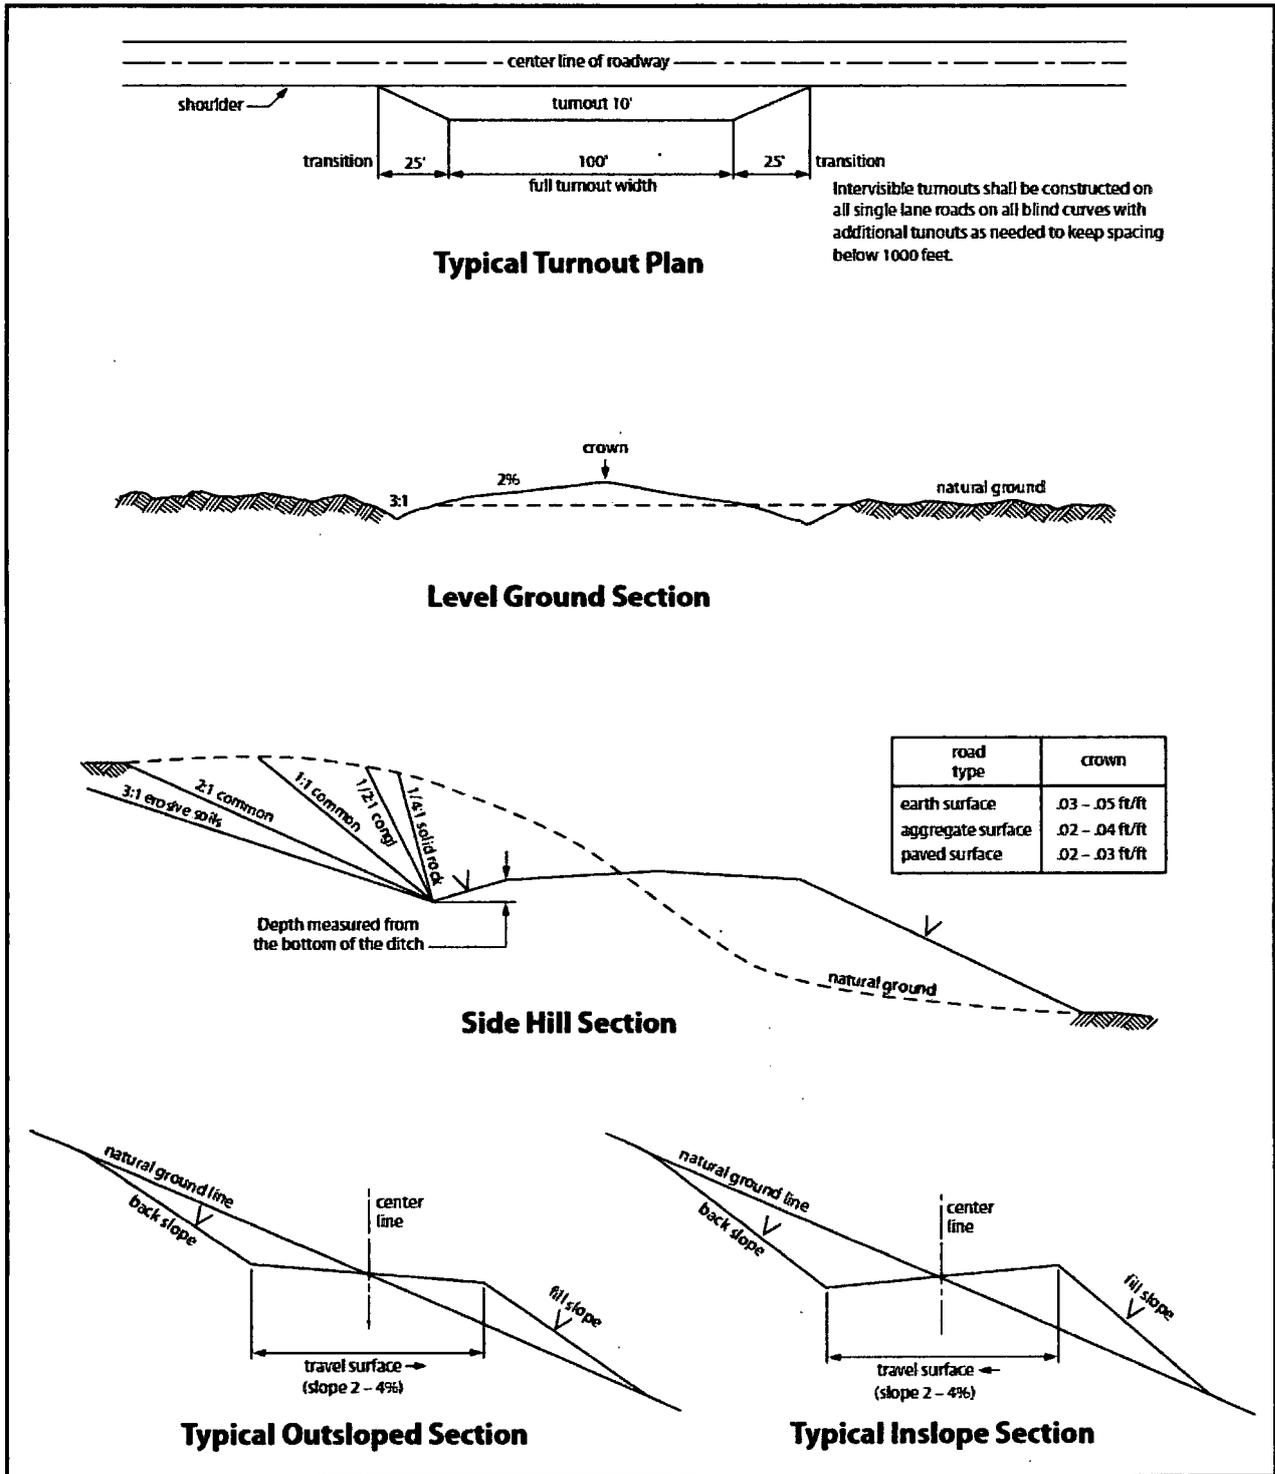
Cross-sections and plans for typical road sections representative of BLM resource or FS local and higher-class roads.
